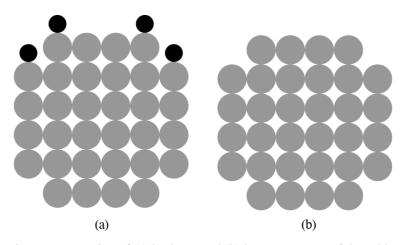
Cross-section of (a) backstay and (b) between towers of the cables
